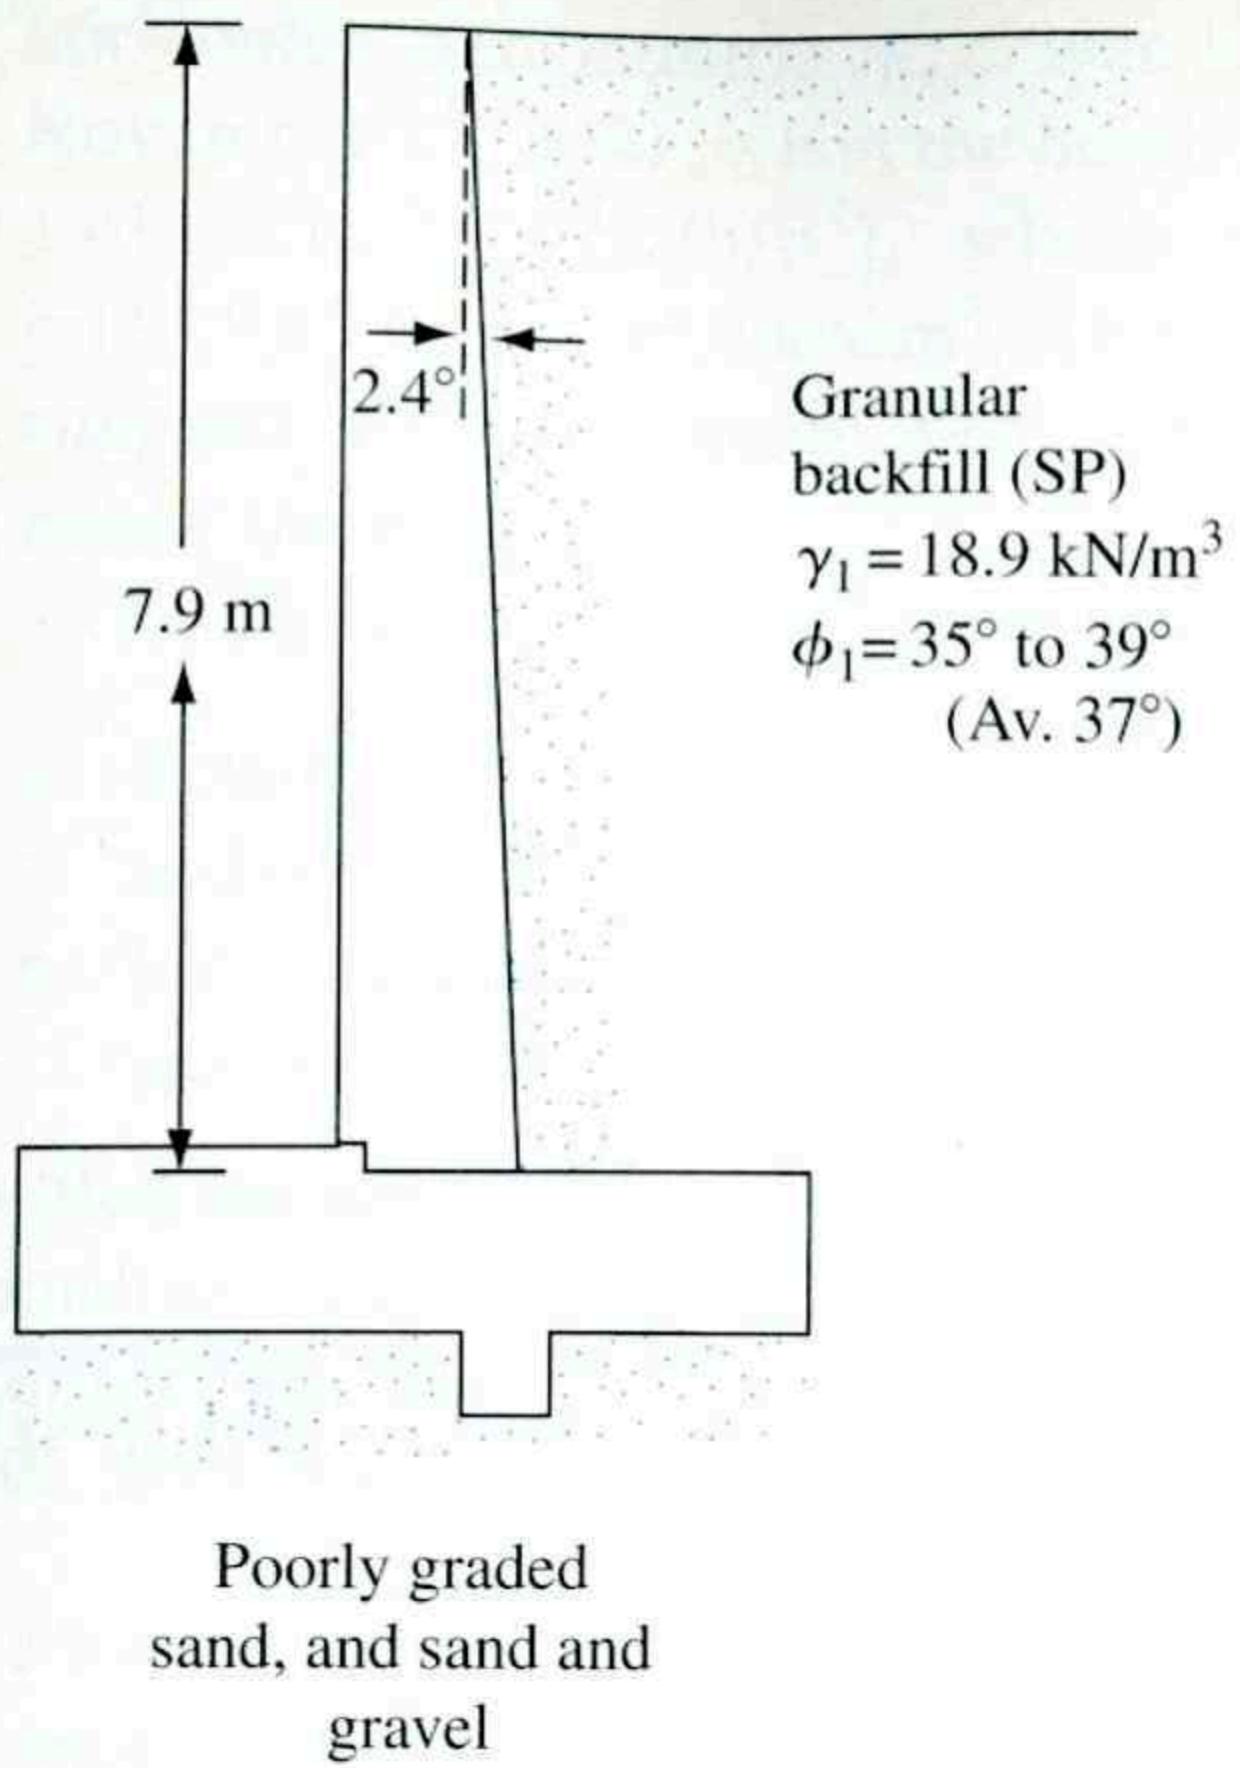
Schematic diagram of the retaining wall (drawn to scale)
